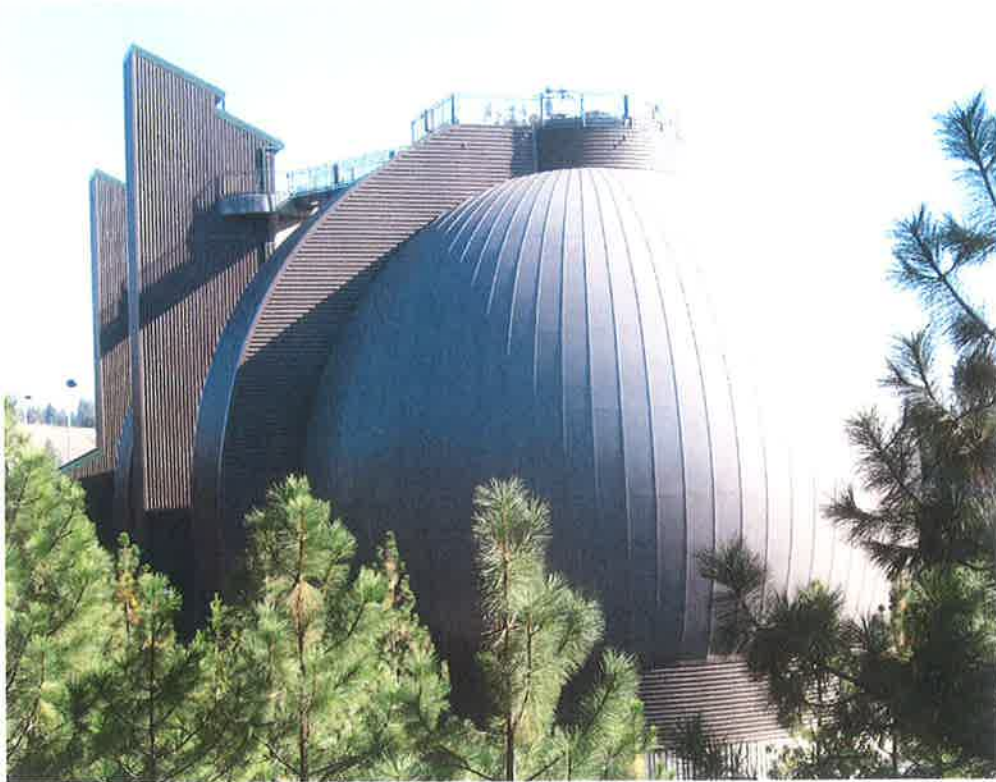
Exhibit K: Outside view of final exterior of finished digester at landscaped site.
